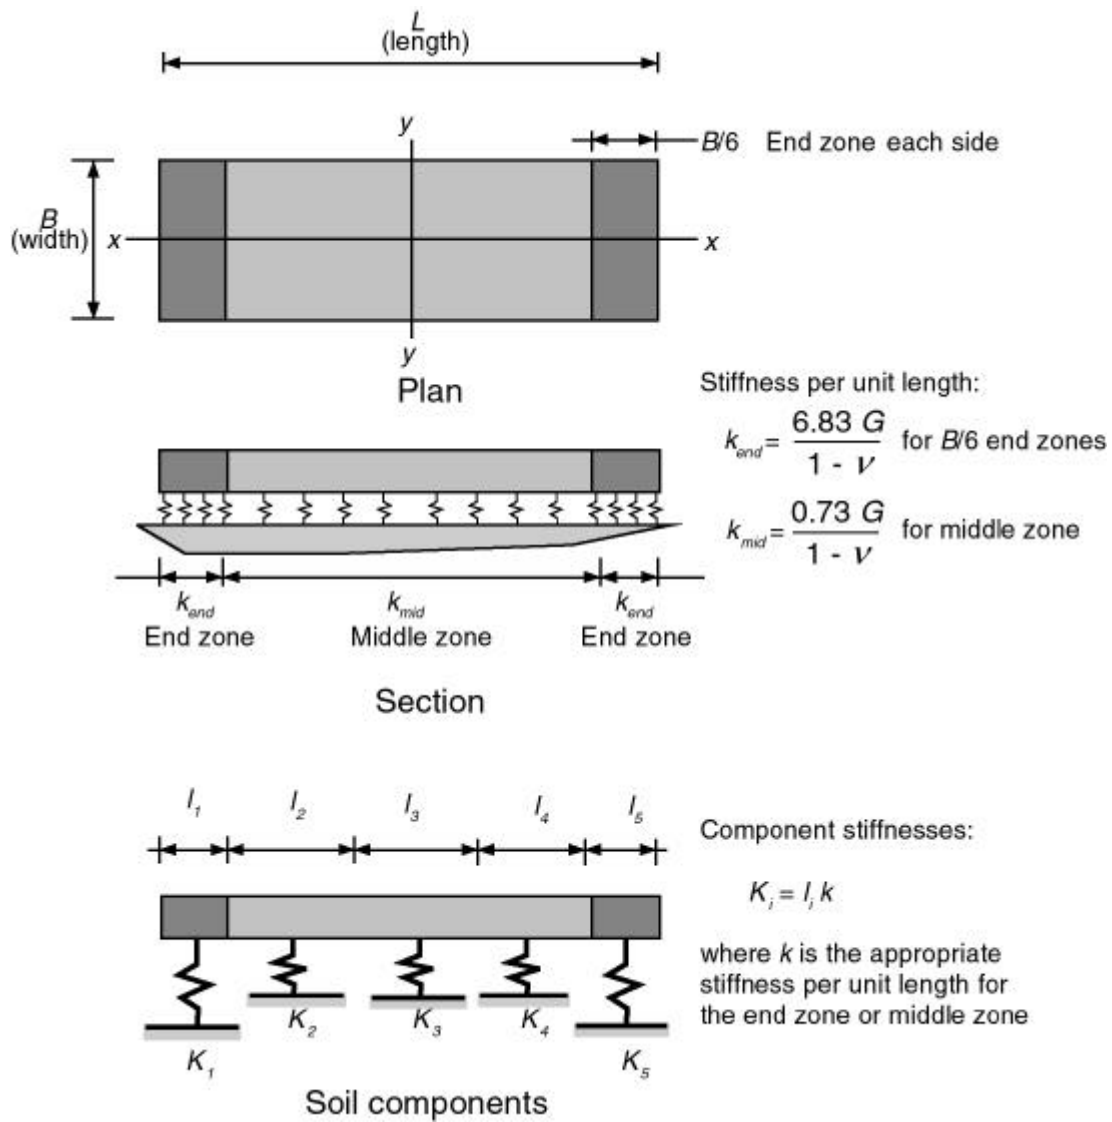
Vertical Stiffness Modeling for Shallow Bearing Footings
